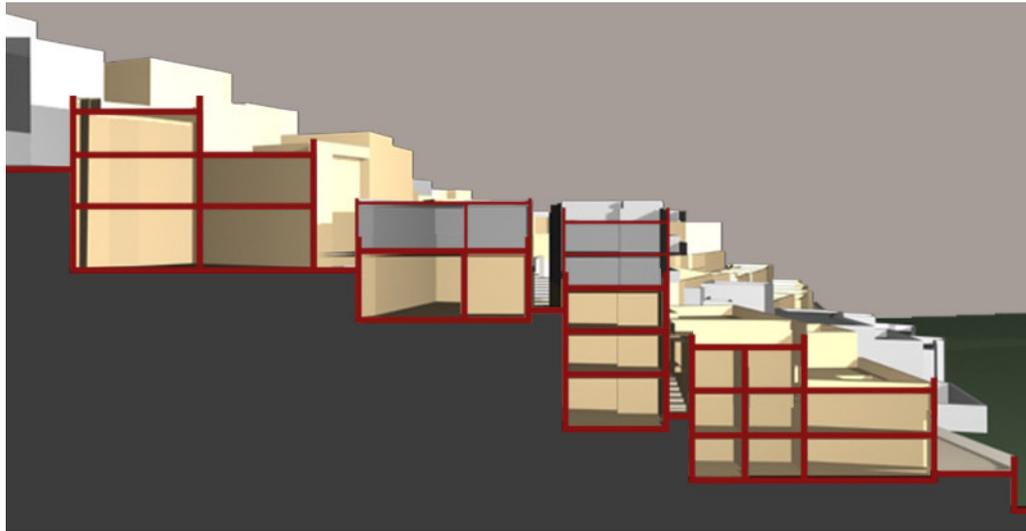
Section A1: The hybrid building avoids the view of the building behind with the additional stories.
